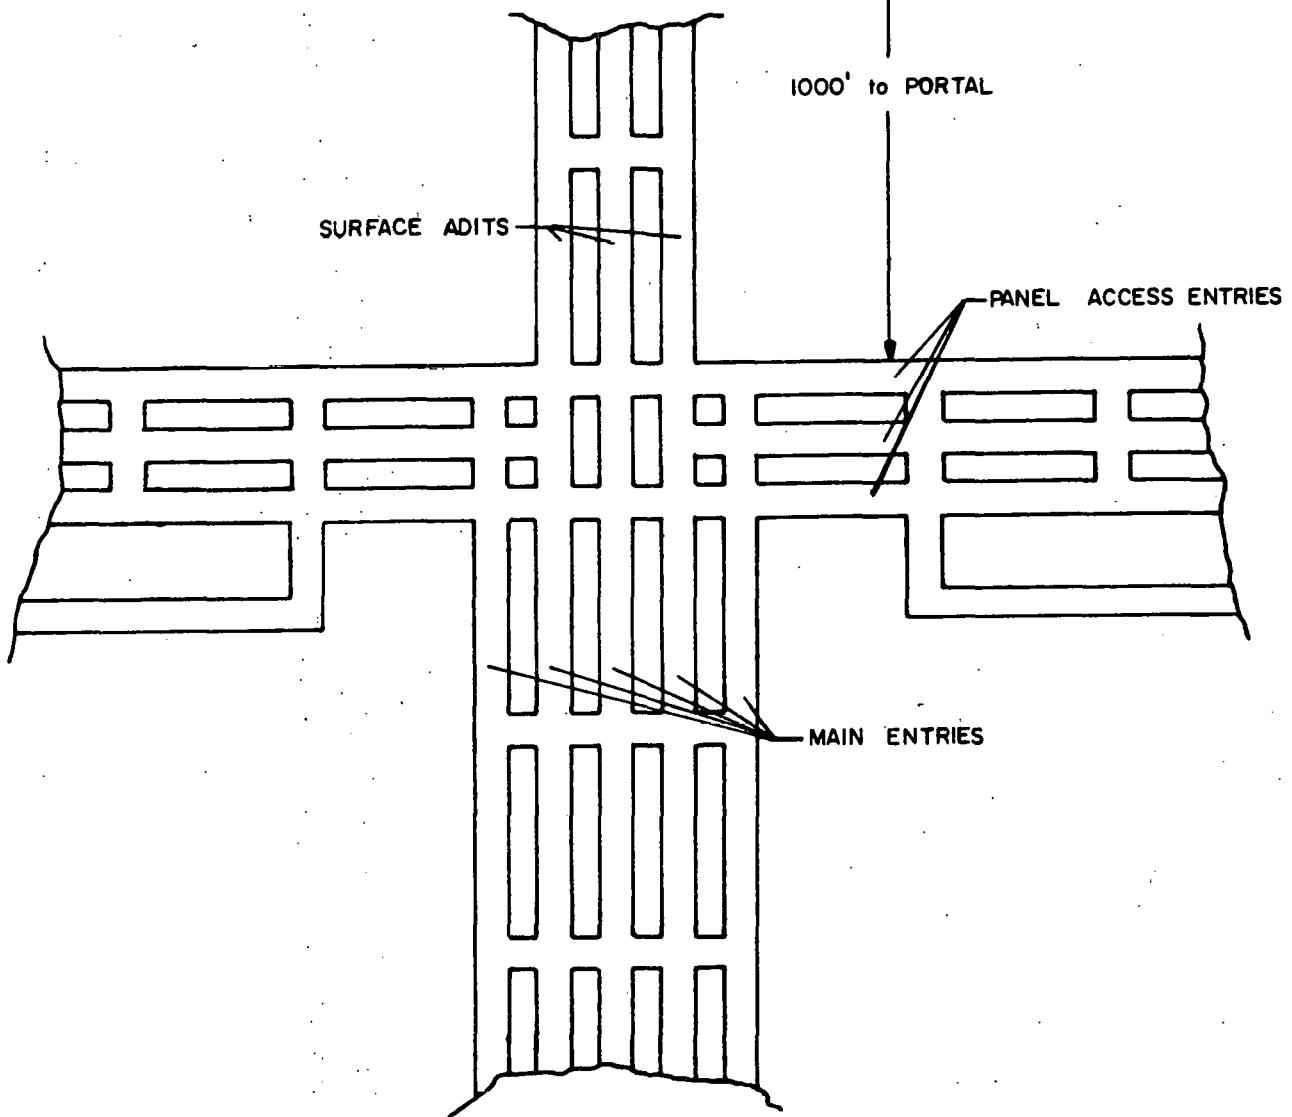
DETAIL OF ADIT ACCESS TO MINING ZONE
